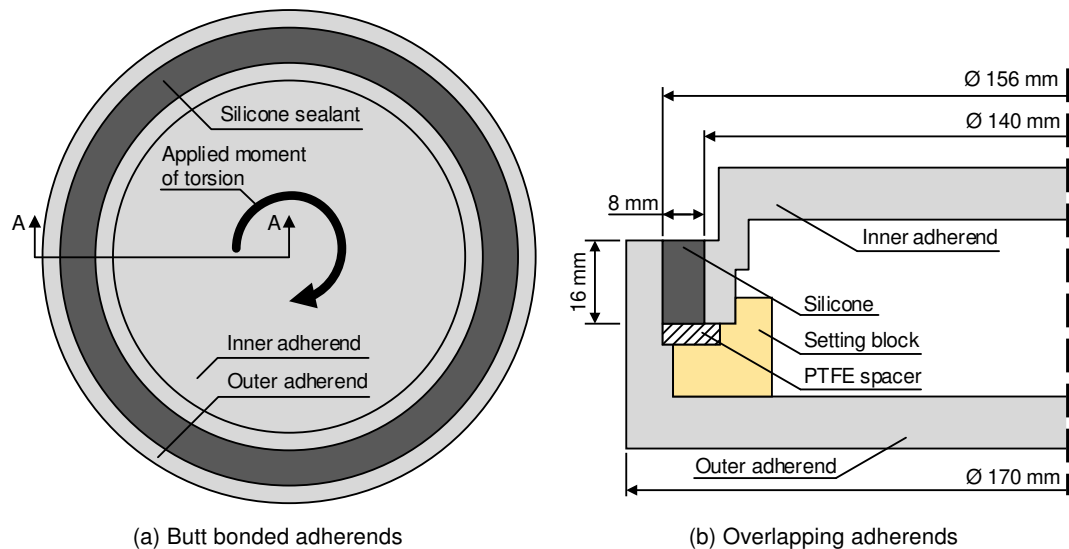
Specimen used for the circular shear test on a bonded connection with silicone
